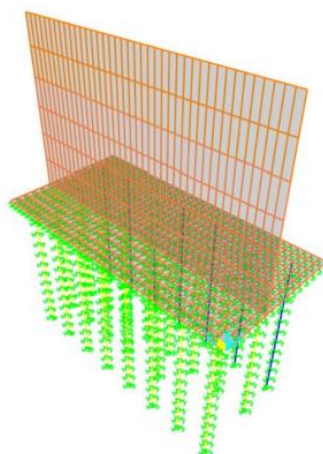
Modeling of 10 Meter Retaining Wall Structure (Section 1 & 2)
